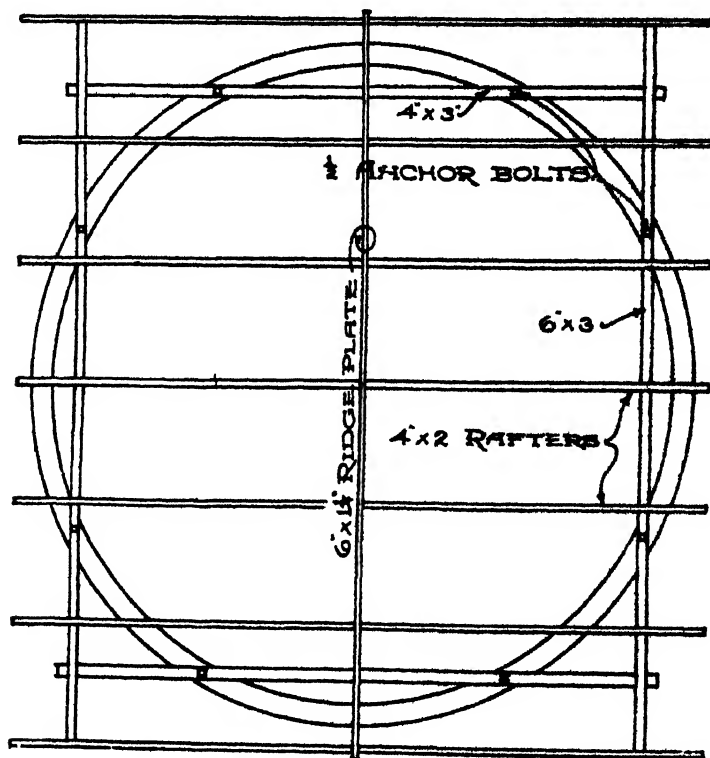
Plan of Roof Frame for Concrete Block Silo.
